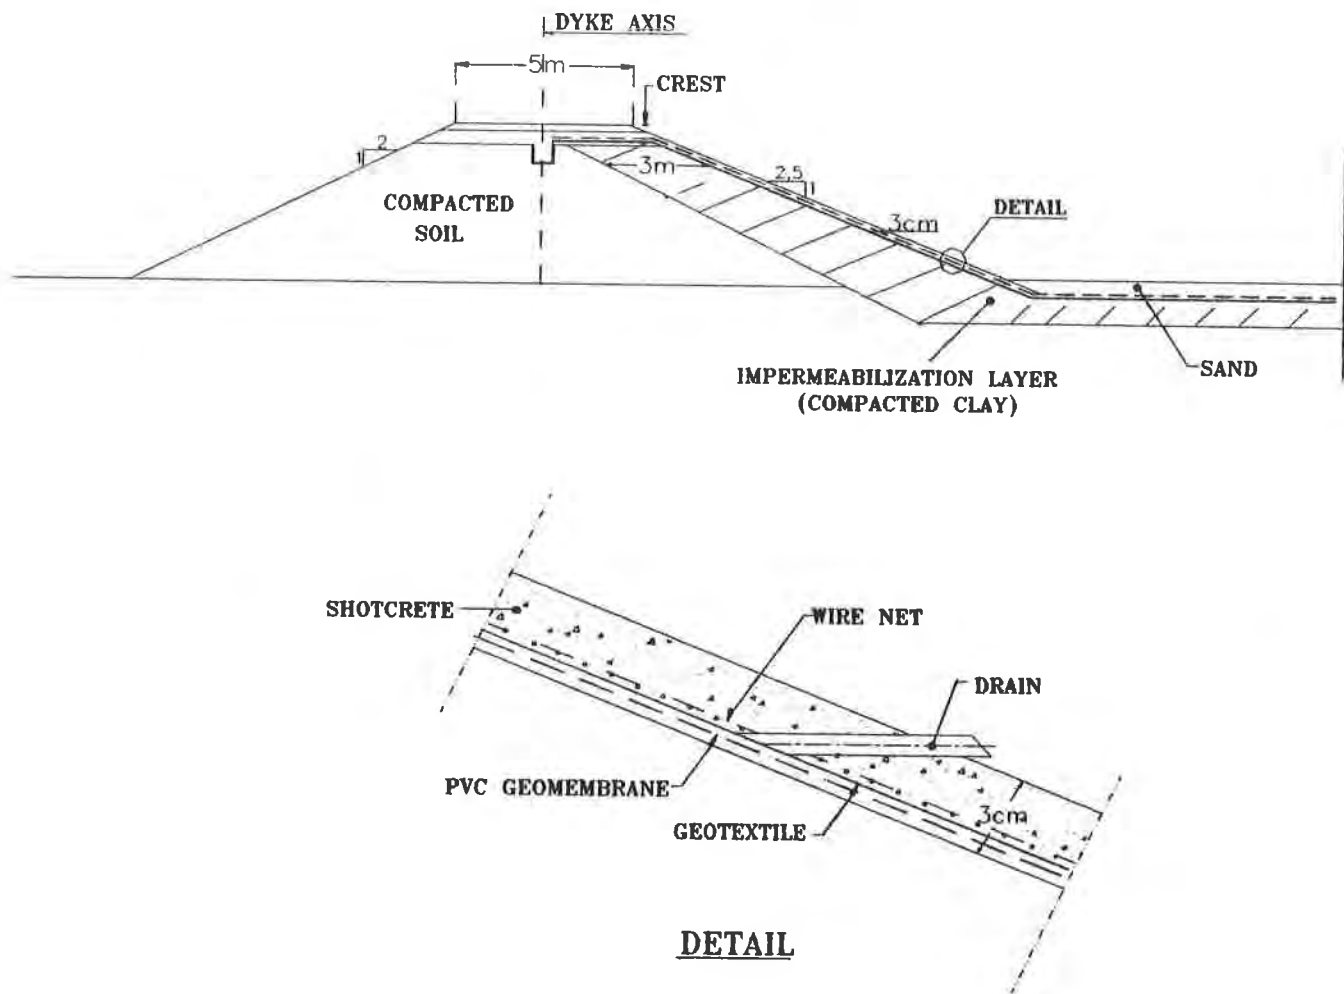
DYKE CROSS-SECTION - PROTECTION WITH SHOTCRETE
